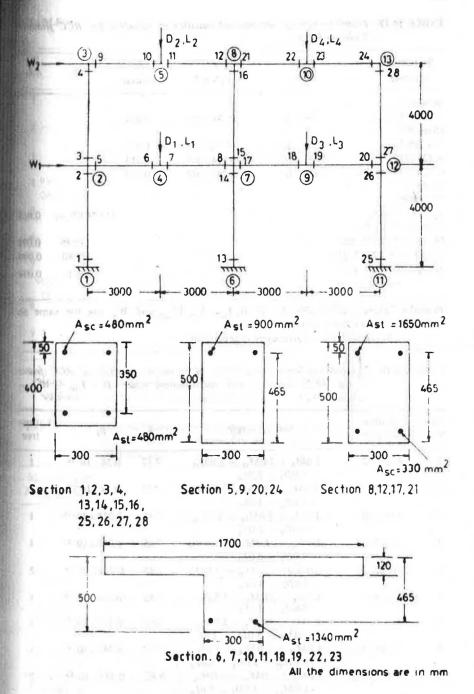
Two-bay two-storey RCC frame and details of cross-sections— Example 10:23
